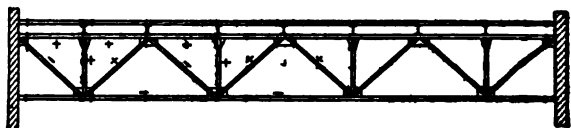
Warren Truss with Verticals. Span Fifty-six Feet
